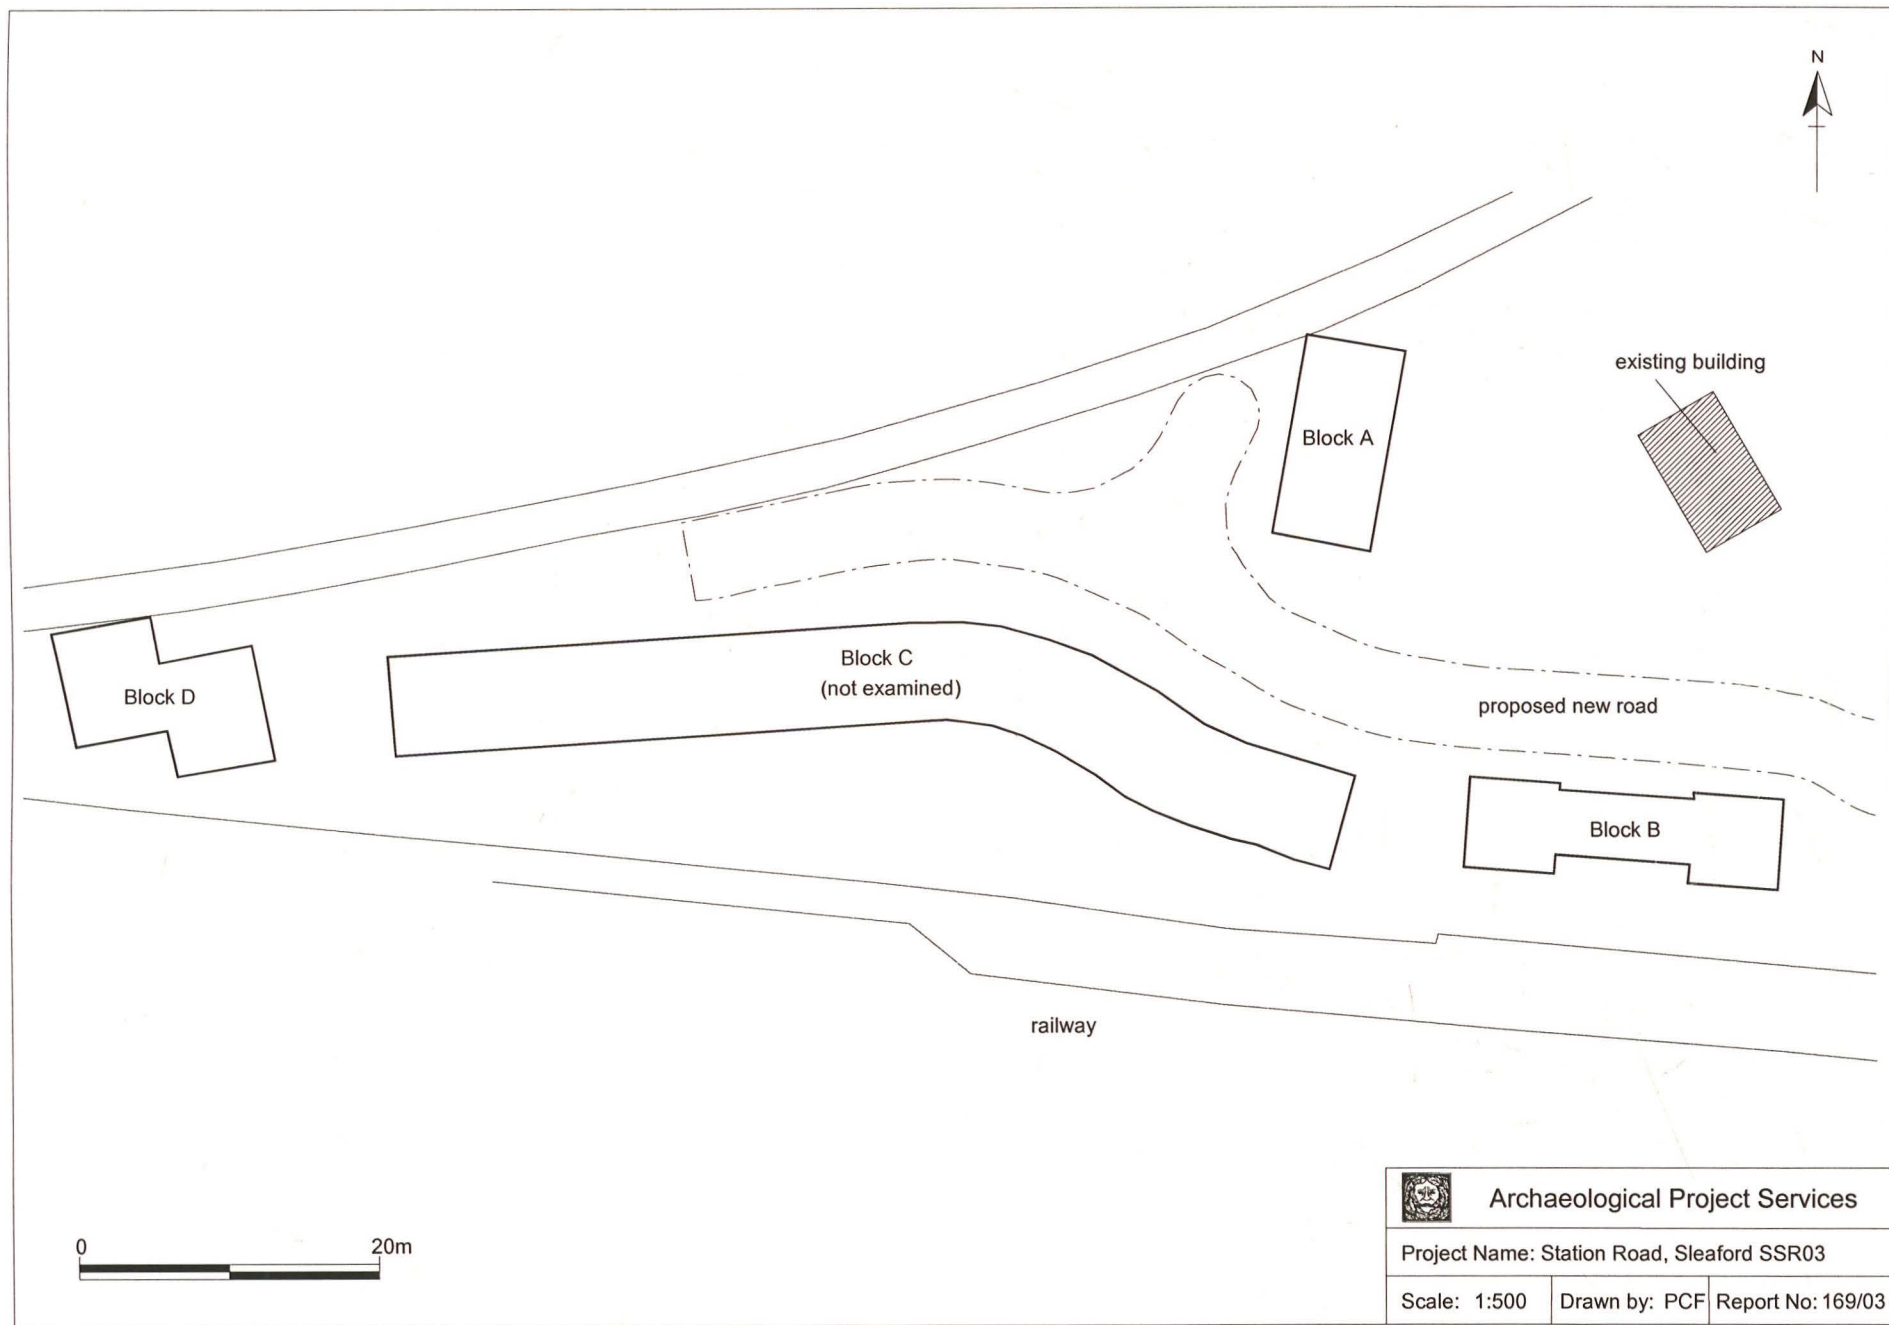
Plan of the development showing locations of Blocks A, B and D
